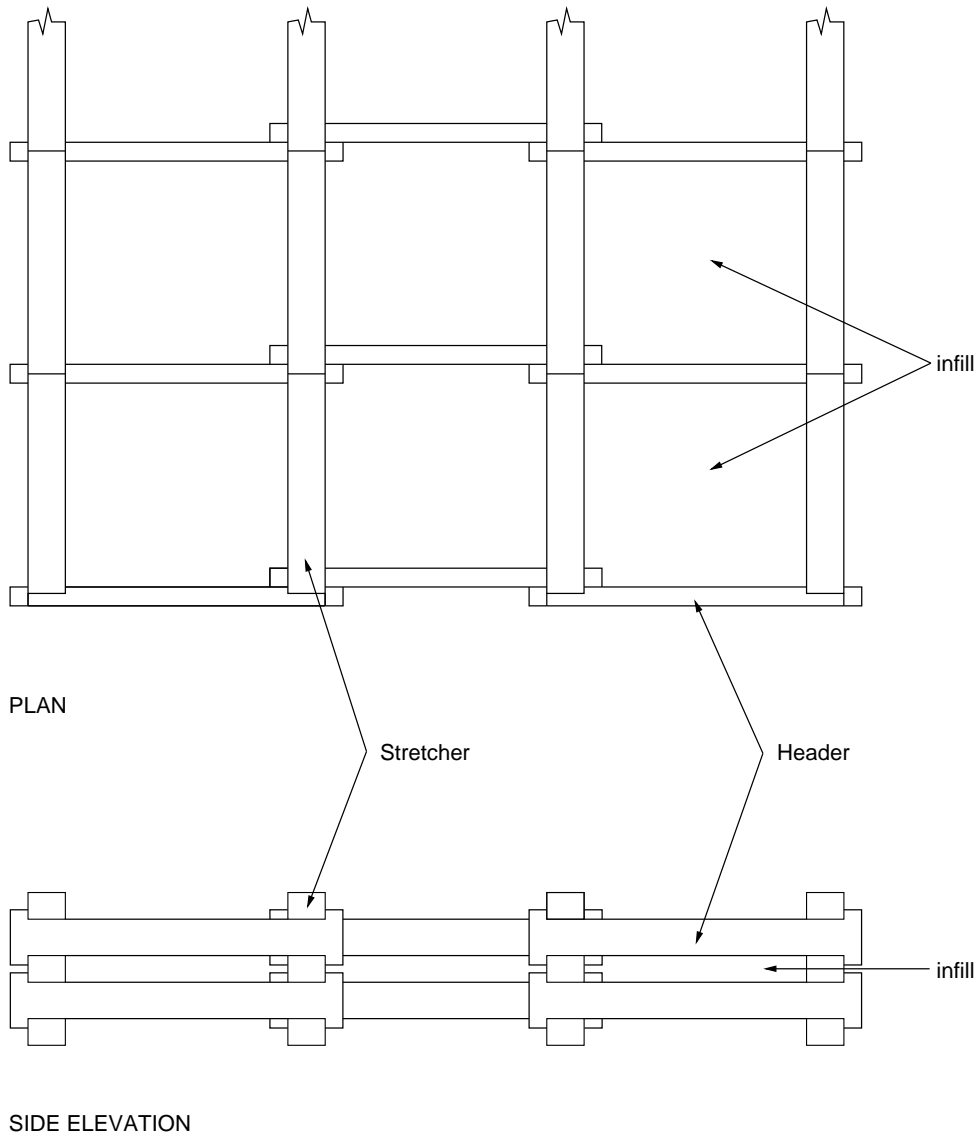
Typical arrangement of crib elements in a multi-cell wall
